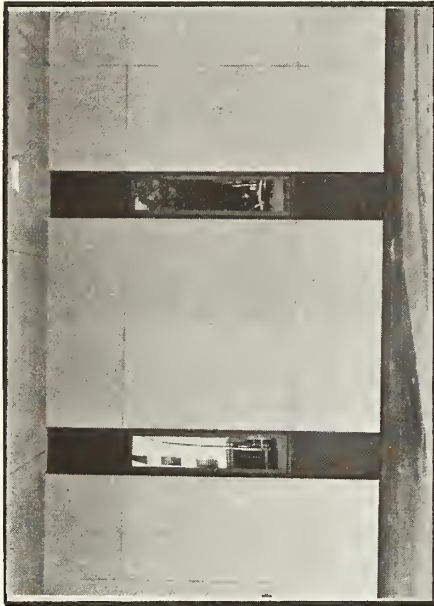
First floor east, exterior wall of the Norris Cotton Federal Office Building
